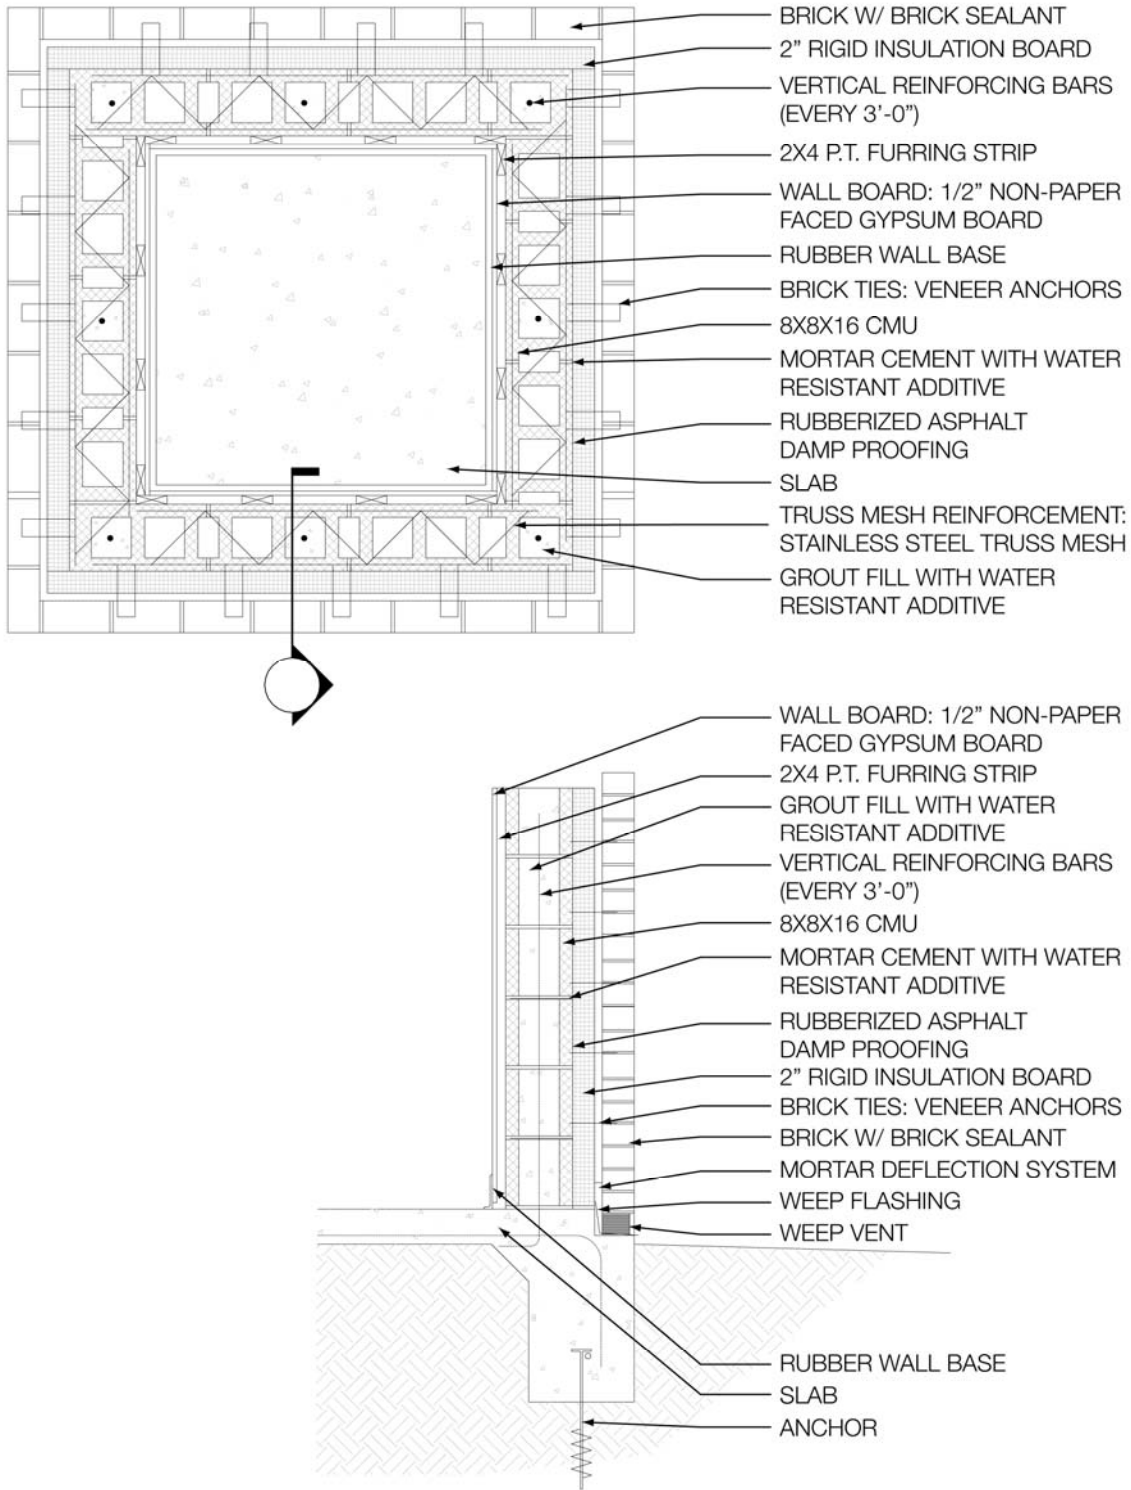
DIAGRAM: Detailed drawings, test pod B: cavity wall.
